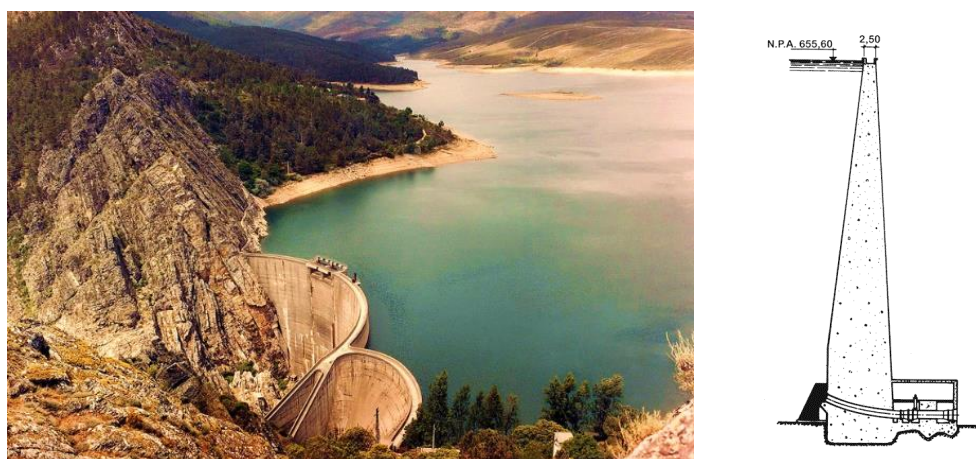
Santa Luzia dam: aerial view (EDP) and (main arch) cross section (CNPGB).
